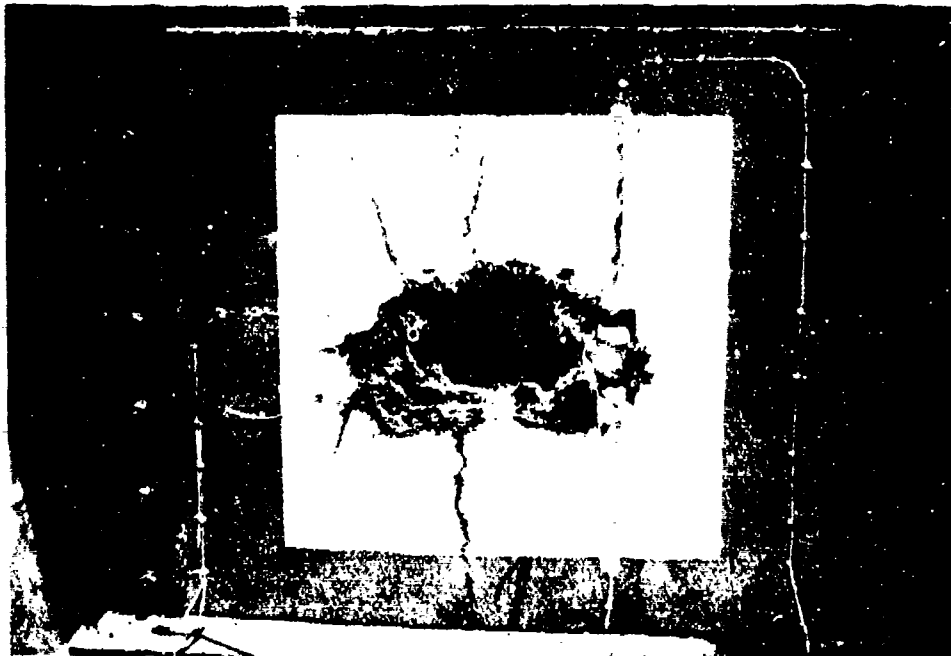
Test 19 Wall Damage (Type C, 2.4-Pound Cased Charge).
